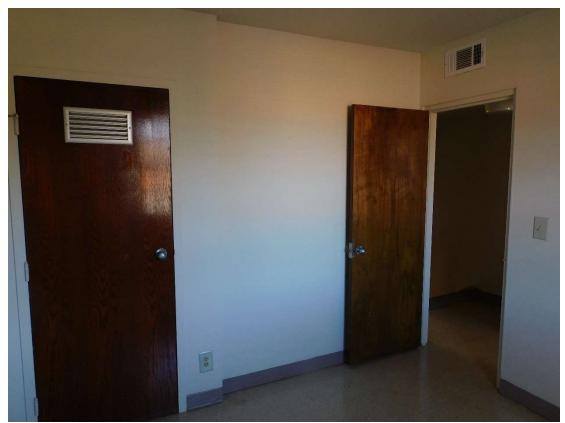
Dogwood Terrace Building C-15/Interior, typical bedroom.
